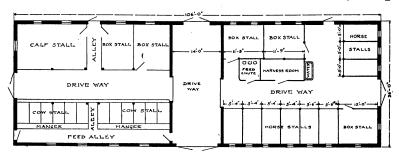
This floor plan shows the convenient arrangement of the Hill Farm barn.
